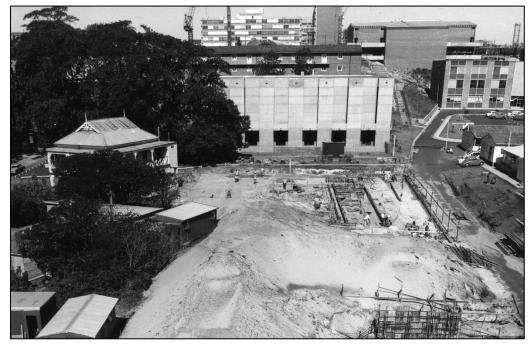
View east in 1965 during construction of Baxter College (Building D14).
